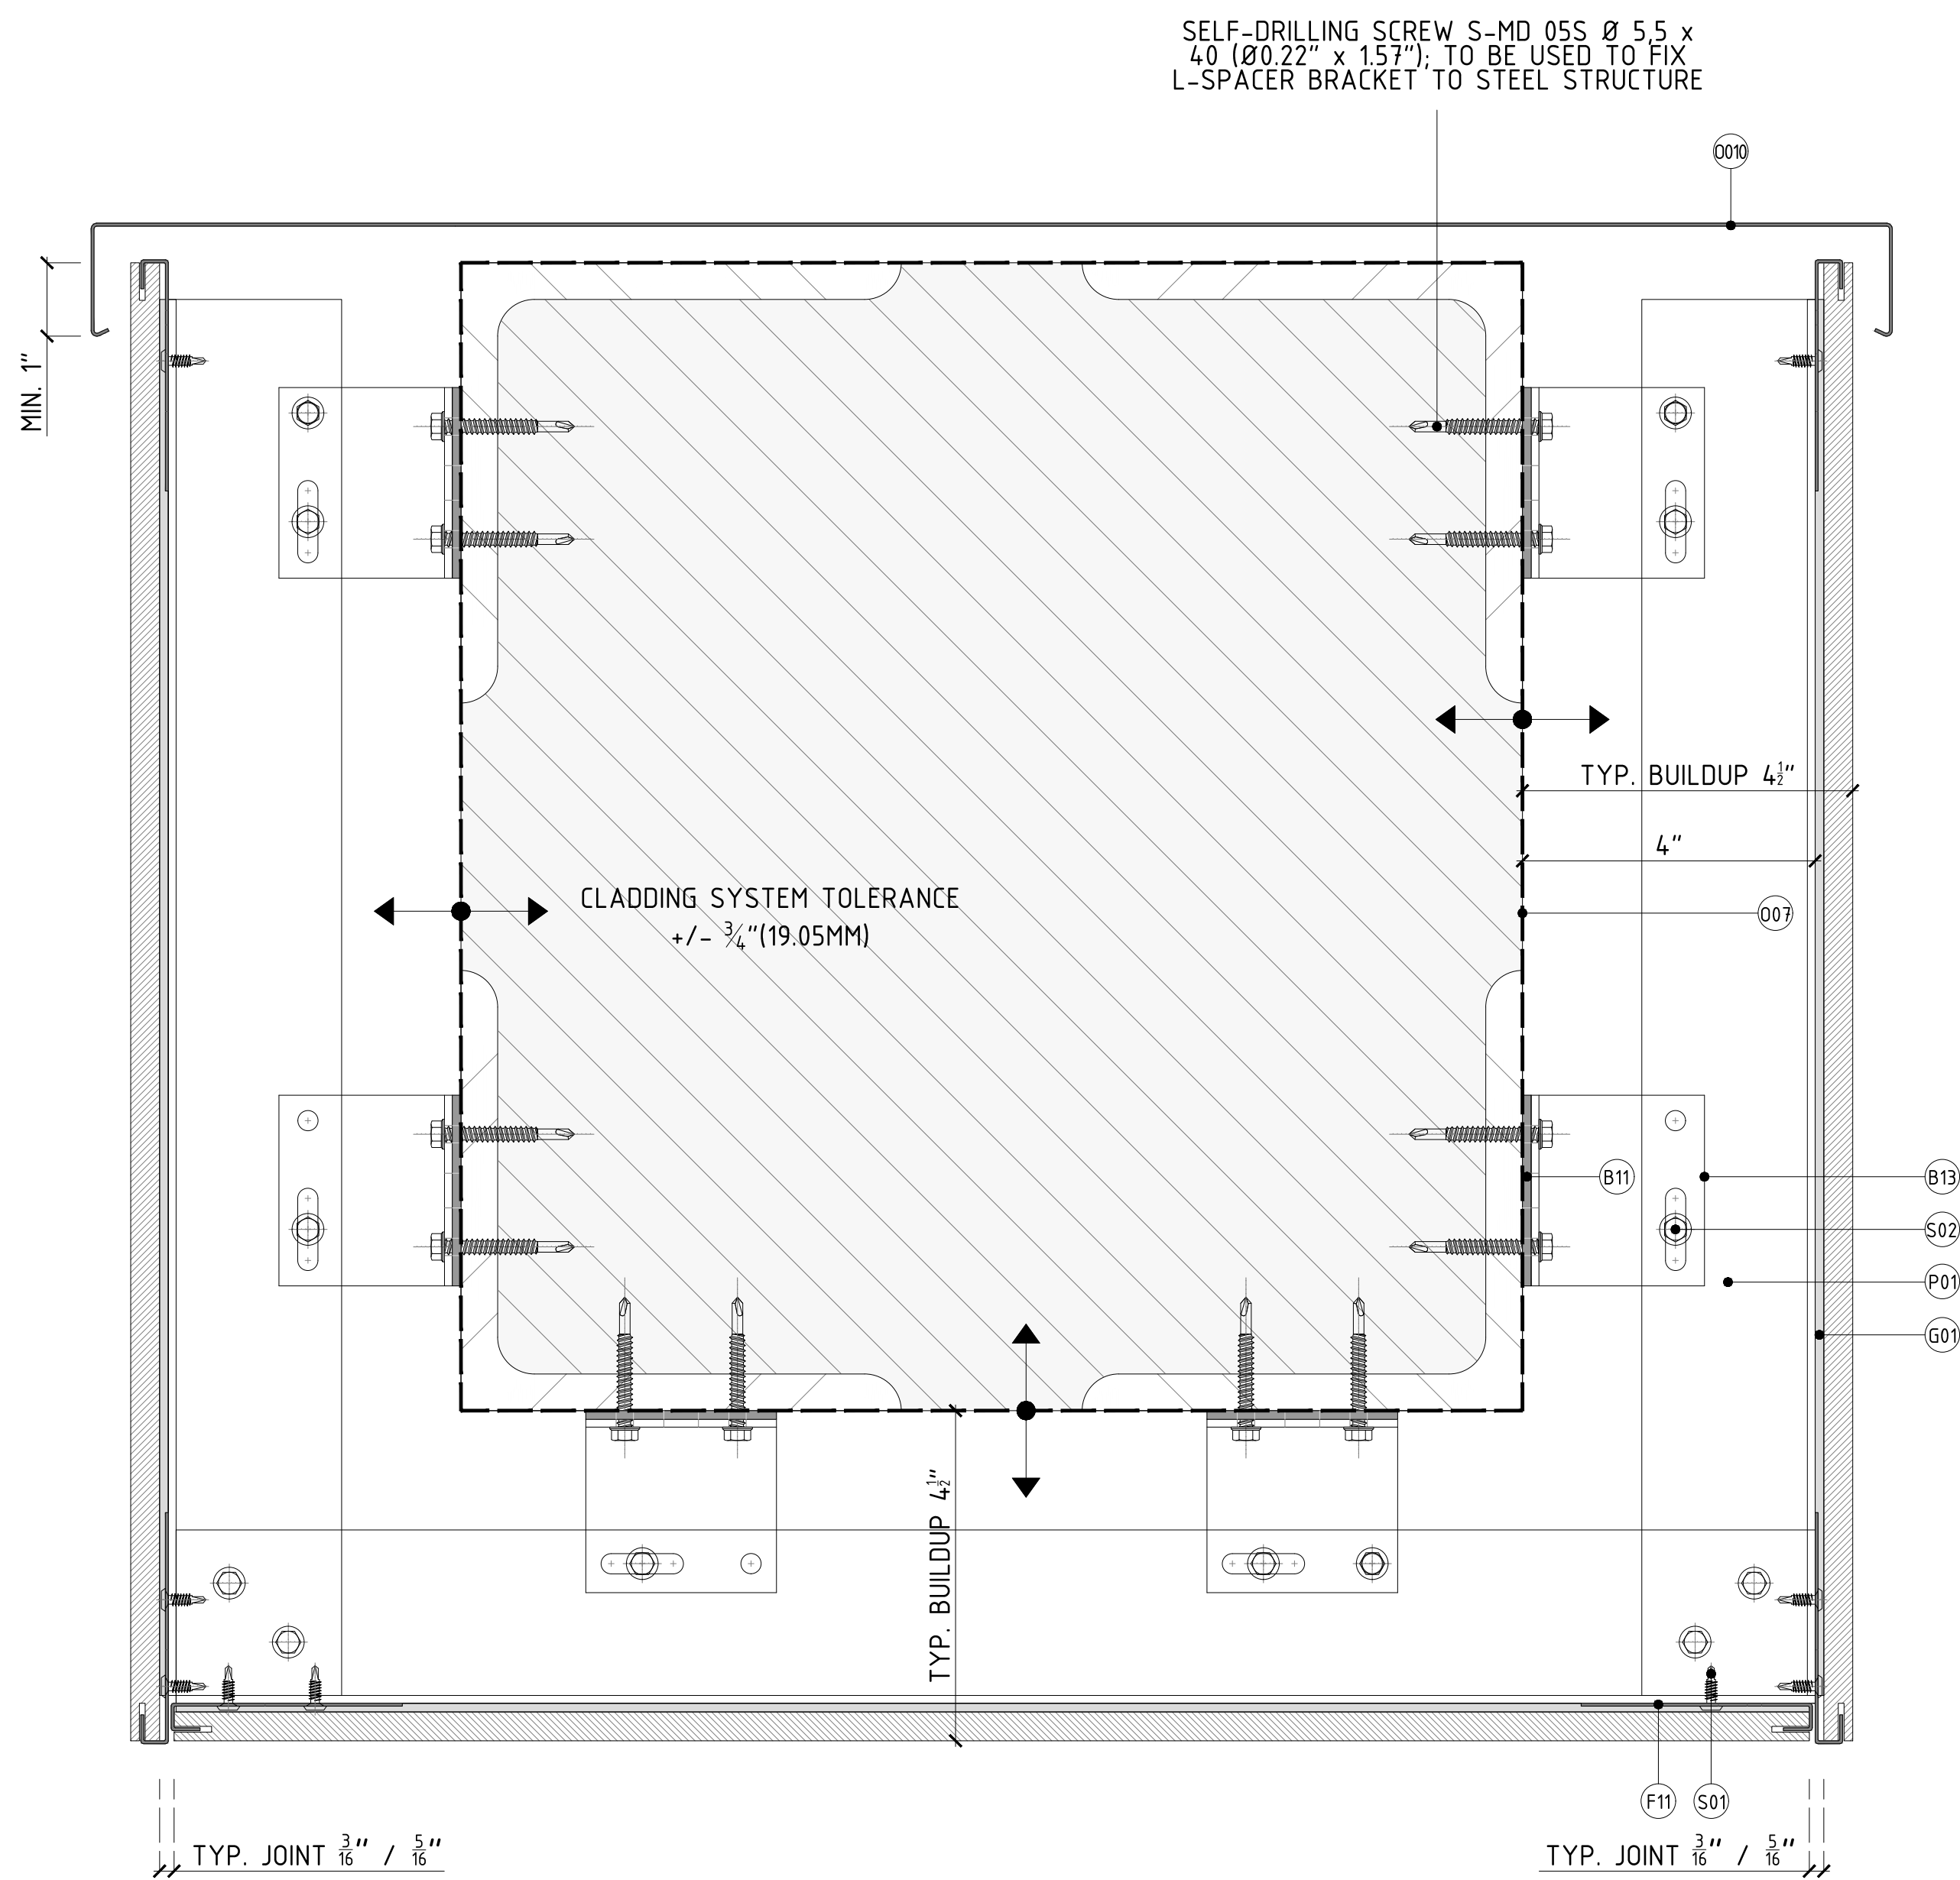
DETAIL B - TYP. WALL SECTION DETAIL @ SYSTEM DEPTH VARIATION
